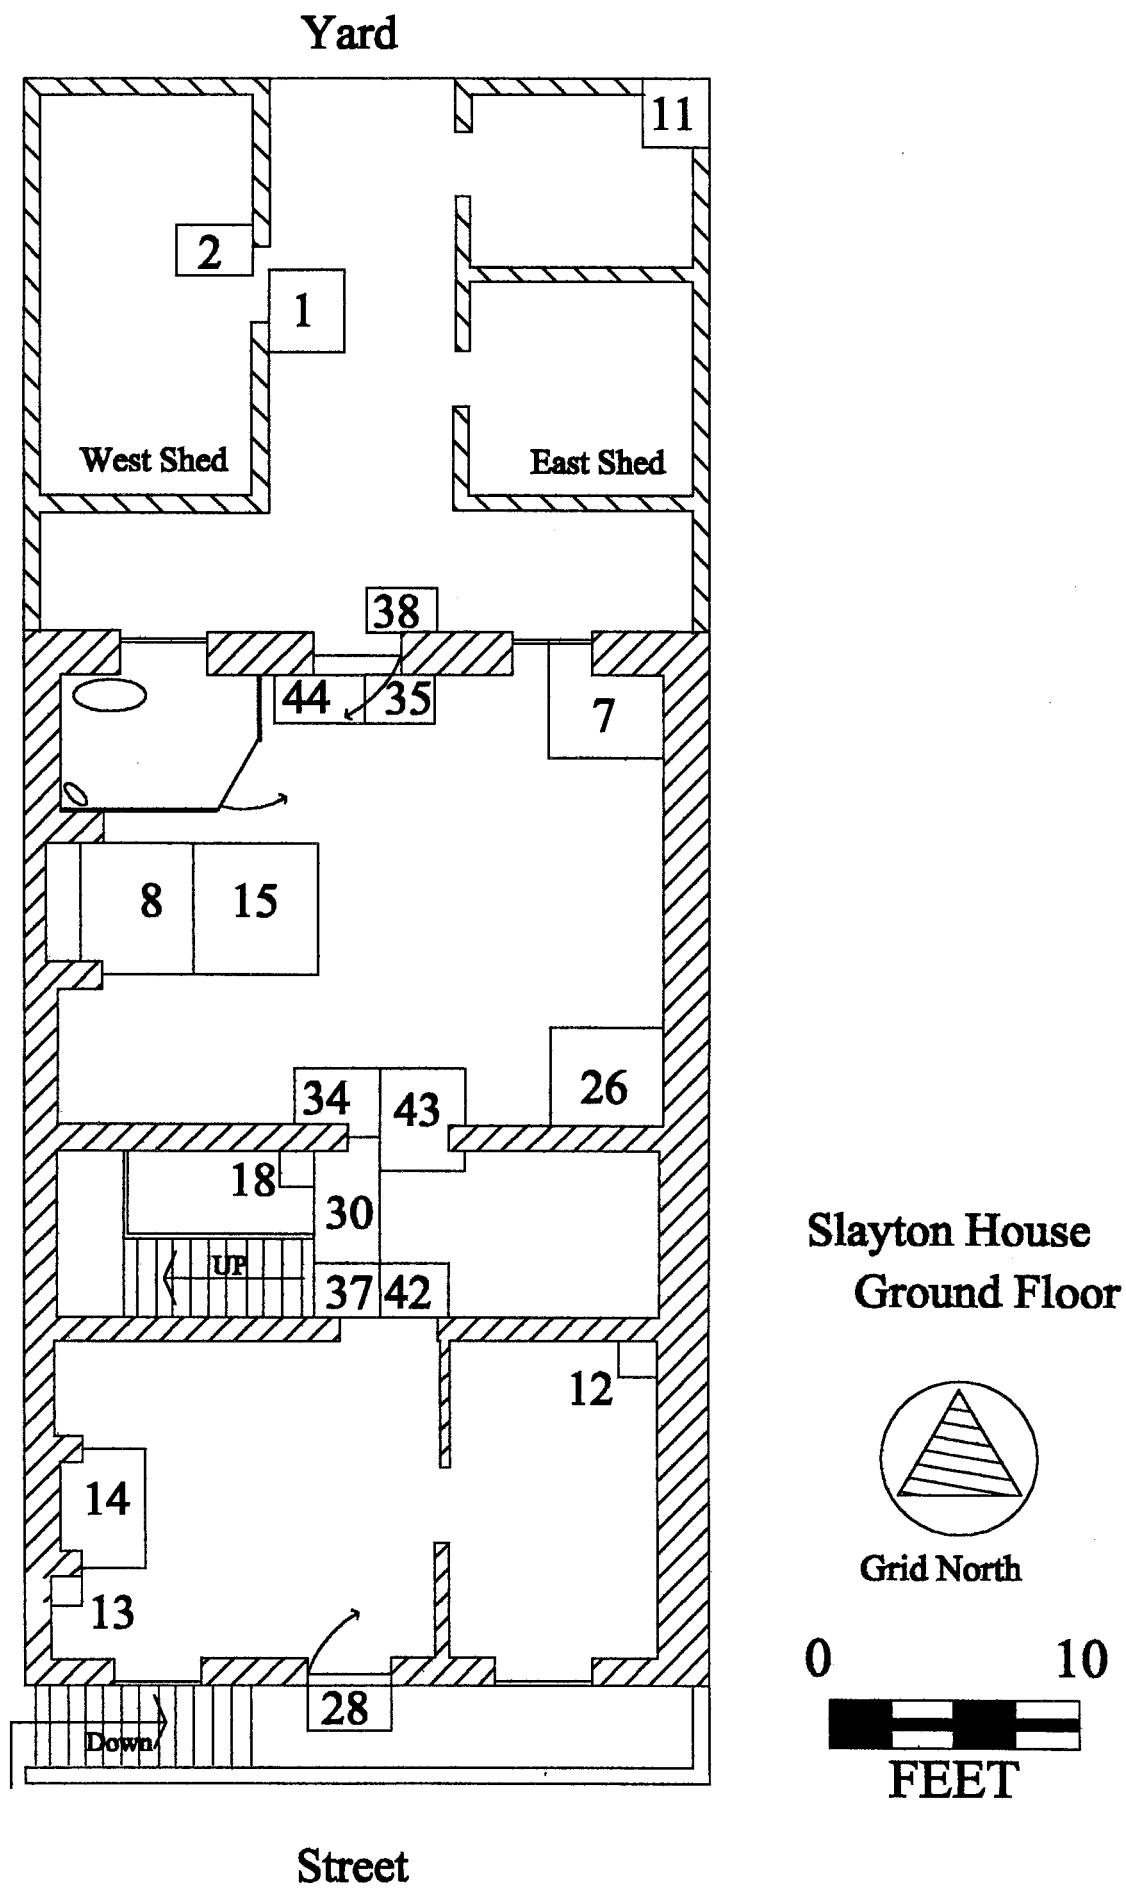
Site Plan, showing excavation units in the ground floor of the house. African-American Bundles 23
